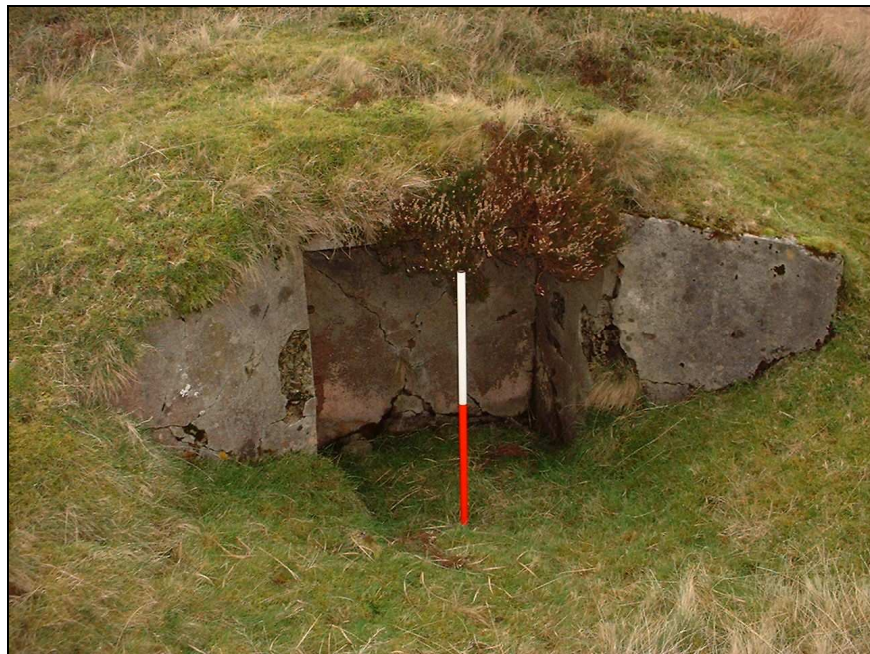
Spalling concrete and render on former battlefield range 1156692
